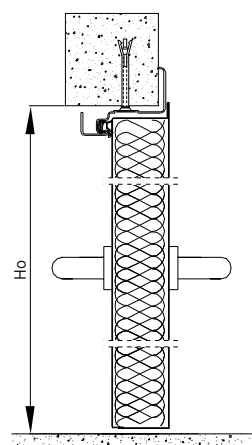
Installation of the single-leaf door with the corner frame in a masonry wall, vertical cross-section
